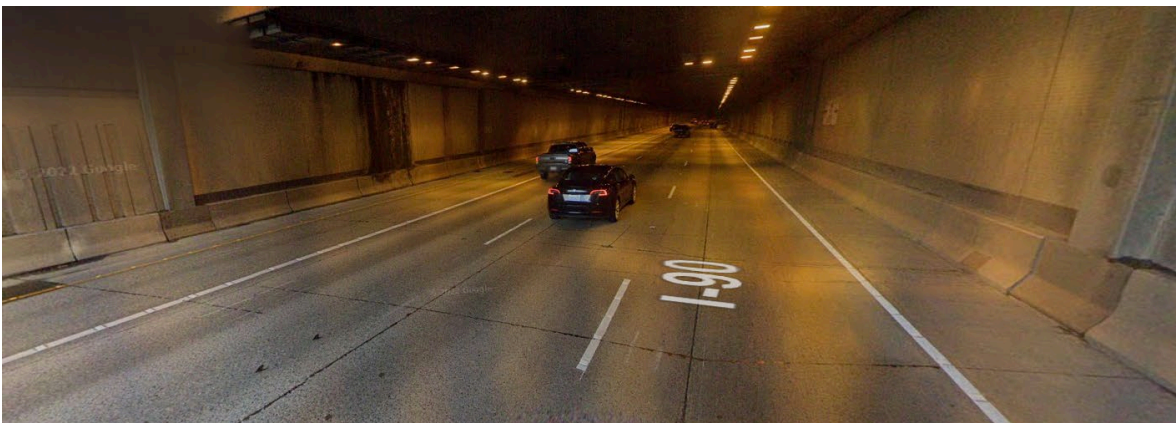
Tunnel with shoulders, no walkways, I-90 Mercer Island, WA
